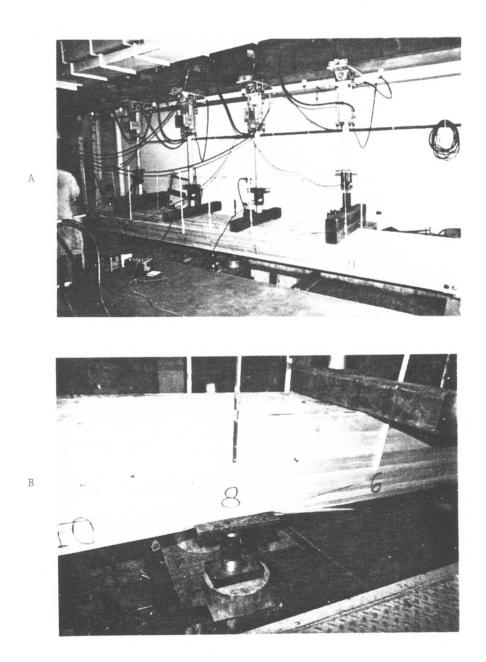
Pre- and Post-Test Photographs of Test Specimen.
